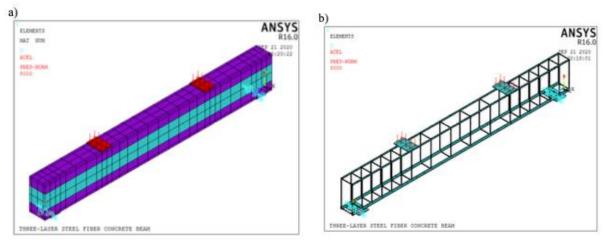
Three-layer model of concrete beam in ANSYS: a) model of a three-layer concrete beam, b) modelling of steel bars in concrete beams.
